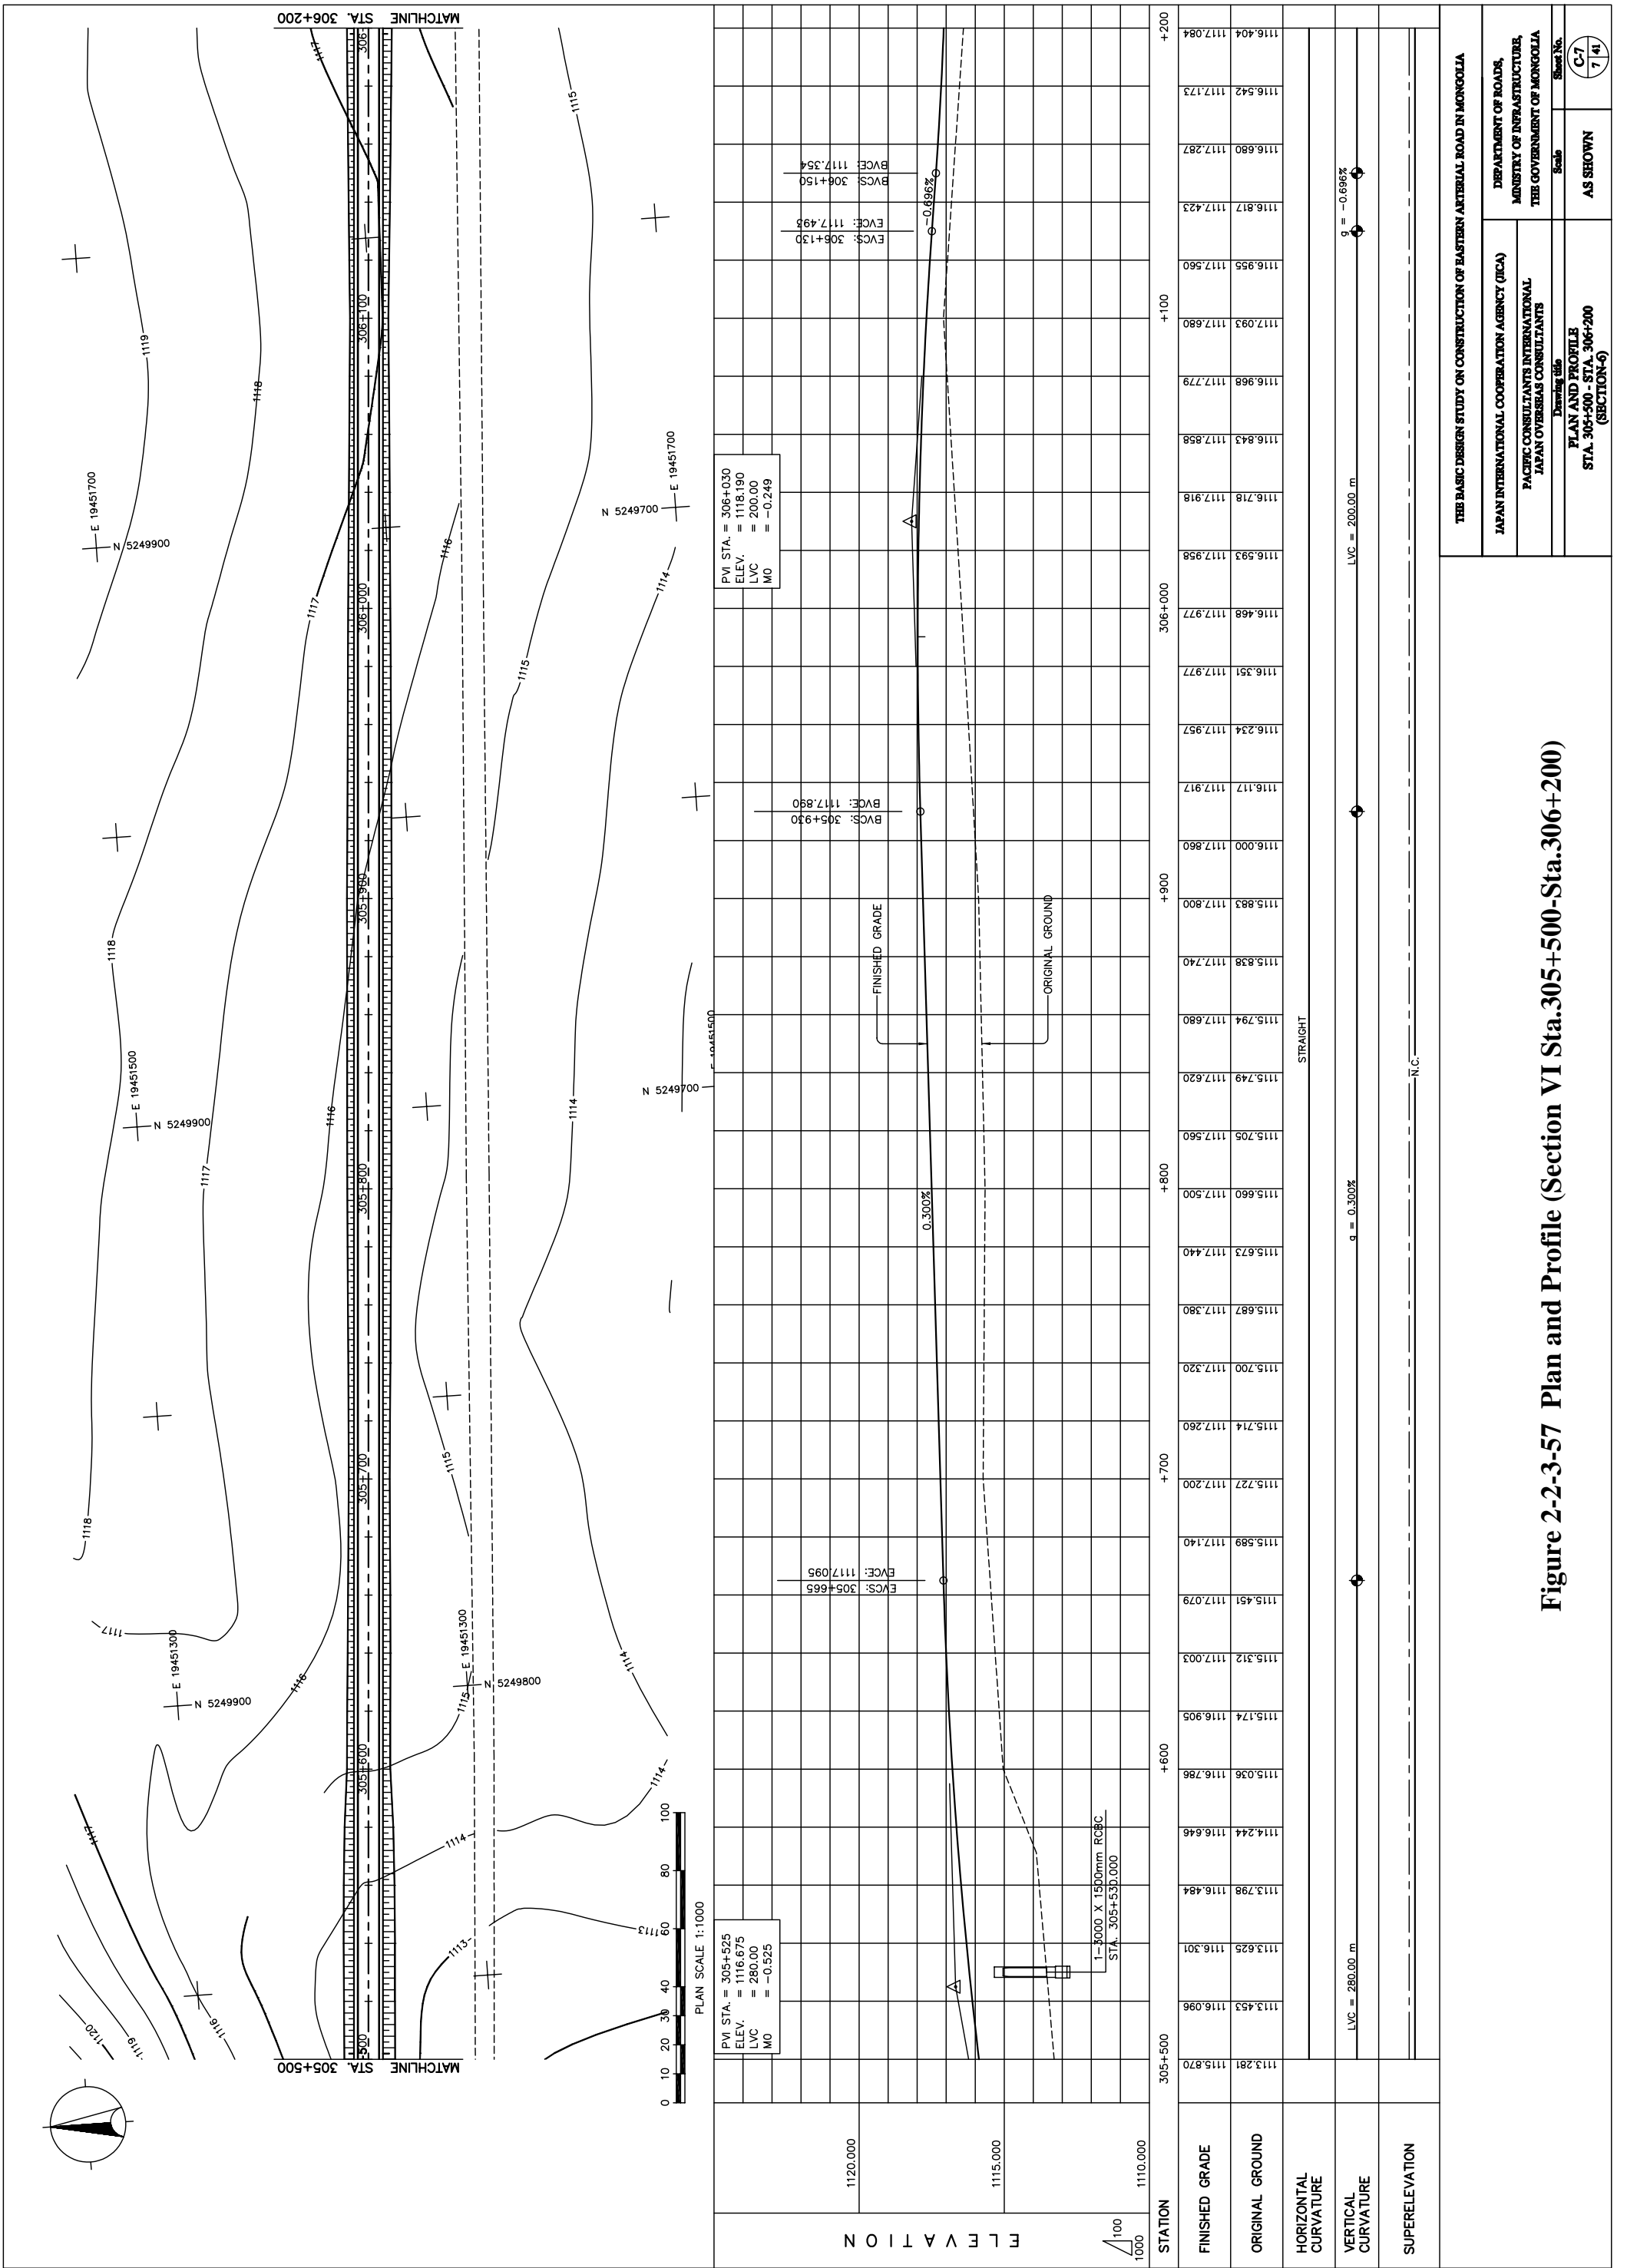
Plan and Profile (Section VI Sta.305+500-Sta.306+200)
